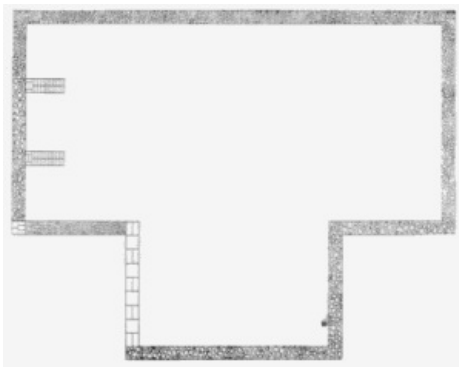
EXCAVATION PLAN of Stafford courthouse foundation.
